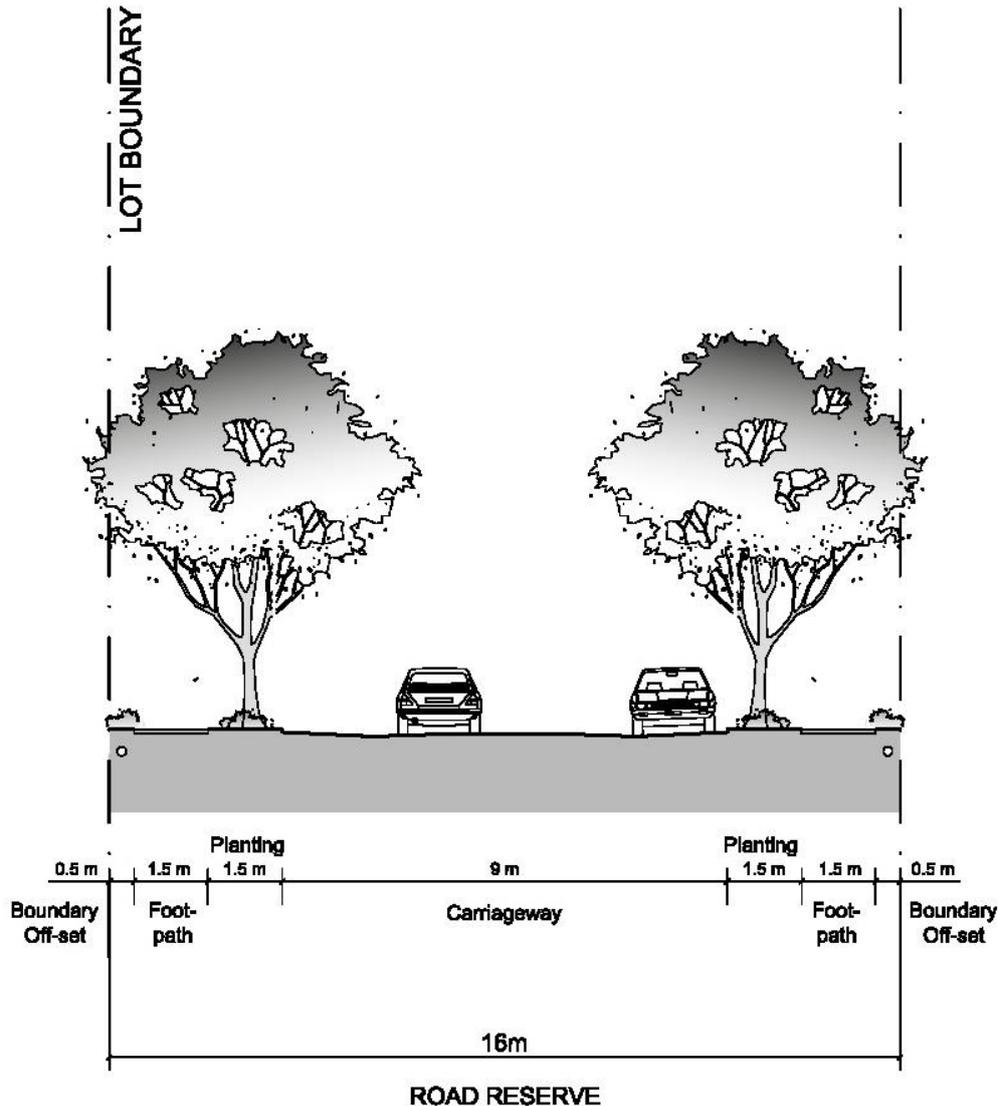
Typical local street when combined with a culvert of 5.5-9.0m in width.
